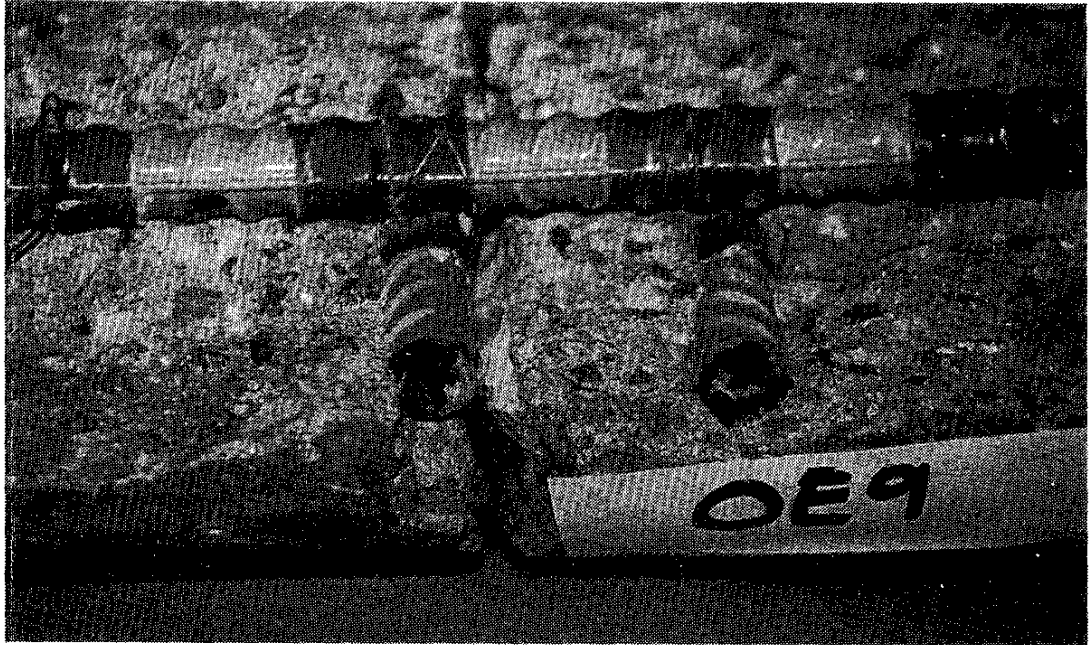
Sample OE9: Epoxy Coated - Wet and Dry - 132 Days.
